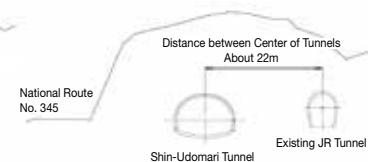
Cross-section of Existing Railway Tunnel at its Nearest Point
